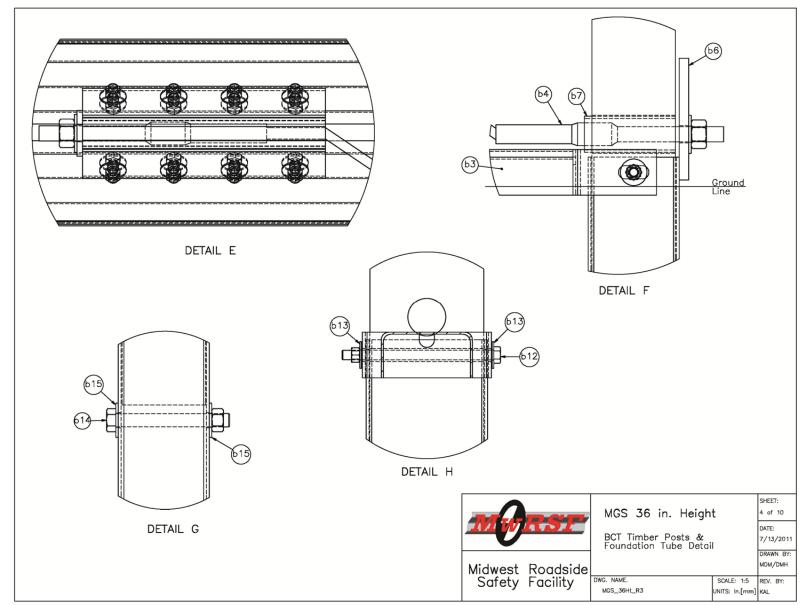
BCT End Anchor Details, Test No. MGSMRH-2
